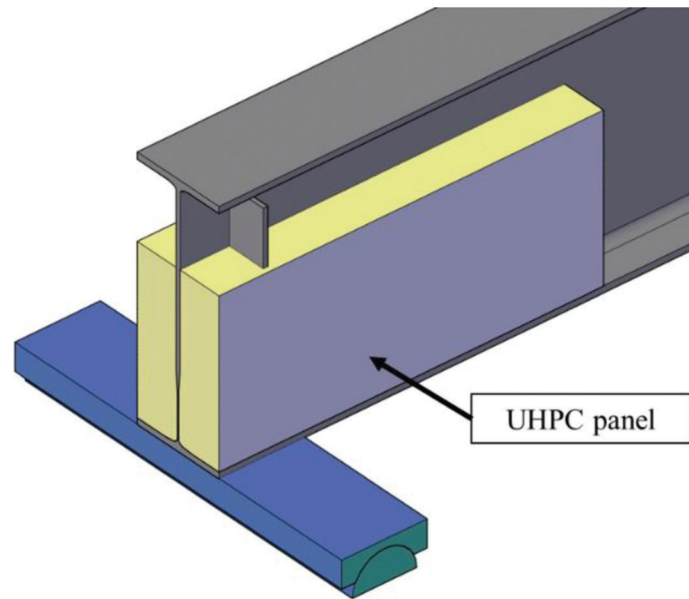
Repaired girder after UHPC curing and disassembling the formwork.
